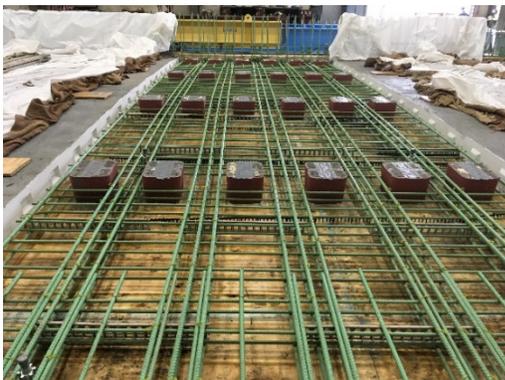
Match Casting of Joints in Precast Concrete Deck Panel
